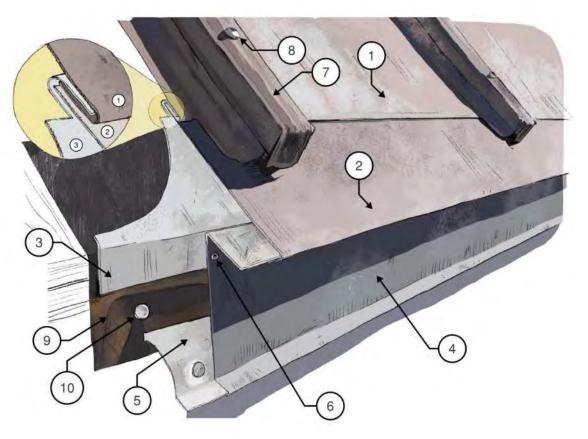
Field Sketch of the sheet metal at draining eave edge. Please note: Some components have been depicted layered, cut-back, expanded, or augmented for clarity. 1. Lead-coated copper roof panels;
